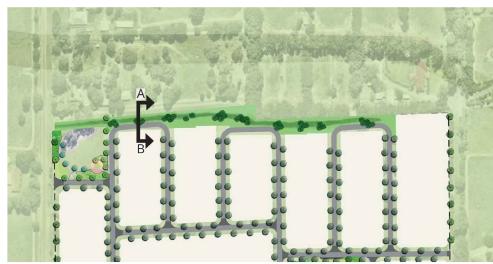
2017 Doley Road Precinct LSP Figures Source: Planning Layout outside of L.S.P. Boundary - Taylor Burrell Barnett LEGEND Note: This plan has been prepared at the direction of Shire of Serpentine Jarrahdale and is subject to approval from the WAPC. LSP BOUNDARY VEGETATION RETENTION AS TRADITIONAL LOTS AND PEEL GREEN GROWTH PLAN FOR 3.5 MILLION OPPORTUNITY FOR COMPACT LOTS COTTAGE LOTS COMMERCIAL / MIXED USE PRIMARY SCHOOL PUBLIC OPEN SPACE INDICATIVE HIGHER ORDER ROAD This plan is an indicative land use concept depicting one hypothetical development scenario for the land and is prepared for illustrative purposes only. It has no formal endorsement or approval status. Any lot boundaries, areas, road networks, public open space or any other land use detail depicted should be considered notional and will be subject to change as part of any subsequent formal planning approval processes. This plan remains the property of CLE. MUC REALIGNMENT AS ADVISED BY SHIRE OF SERPENTINE JARRAHDALI SUBJECT TO MODIFIED DWMS APPROVAL RECREATION ROAD CLOSUR CONSOLIDATION & LOCATION OF P.O.S. AS REQUIRED BY SHIRE OF SERPENTINE JARRAHDALE PRIMARY SCHOOL OF ORTON ROAD CONSOLIDATION & LOCATION OF P.O.S. AS REQUIRED BY SHIRE OF ORTON ROAD WIDENING LOCATION OF P.O.S. AS REQUIRED BY SHIRE OF SERPENTINE JARRAHDALE PROPOSED ORTON ROAD REALIGNMENT The Glades - LSP LWP PROPERTY GROUP PTY LT SERPENTINE JARRAHDALE
